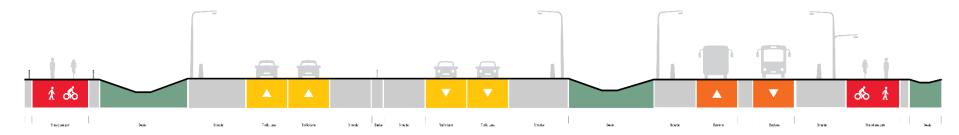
Indicative Alternative State Highway cross sections – West of Taupaki Road
